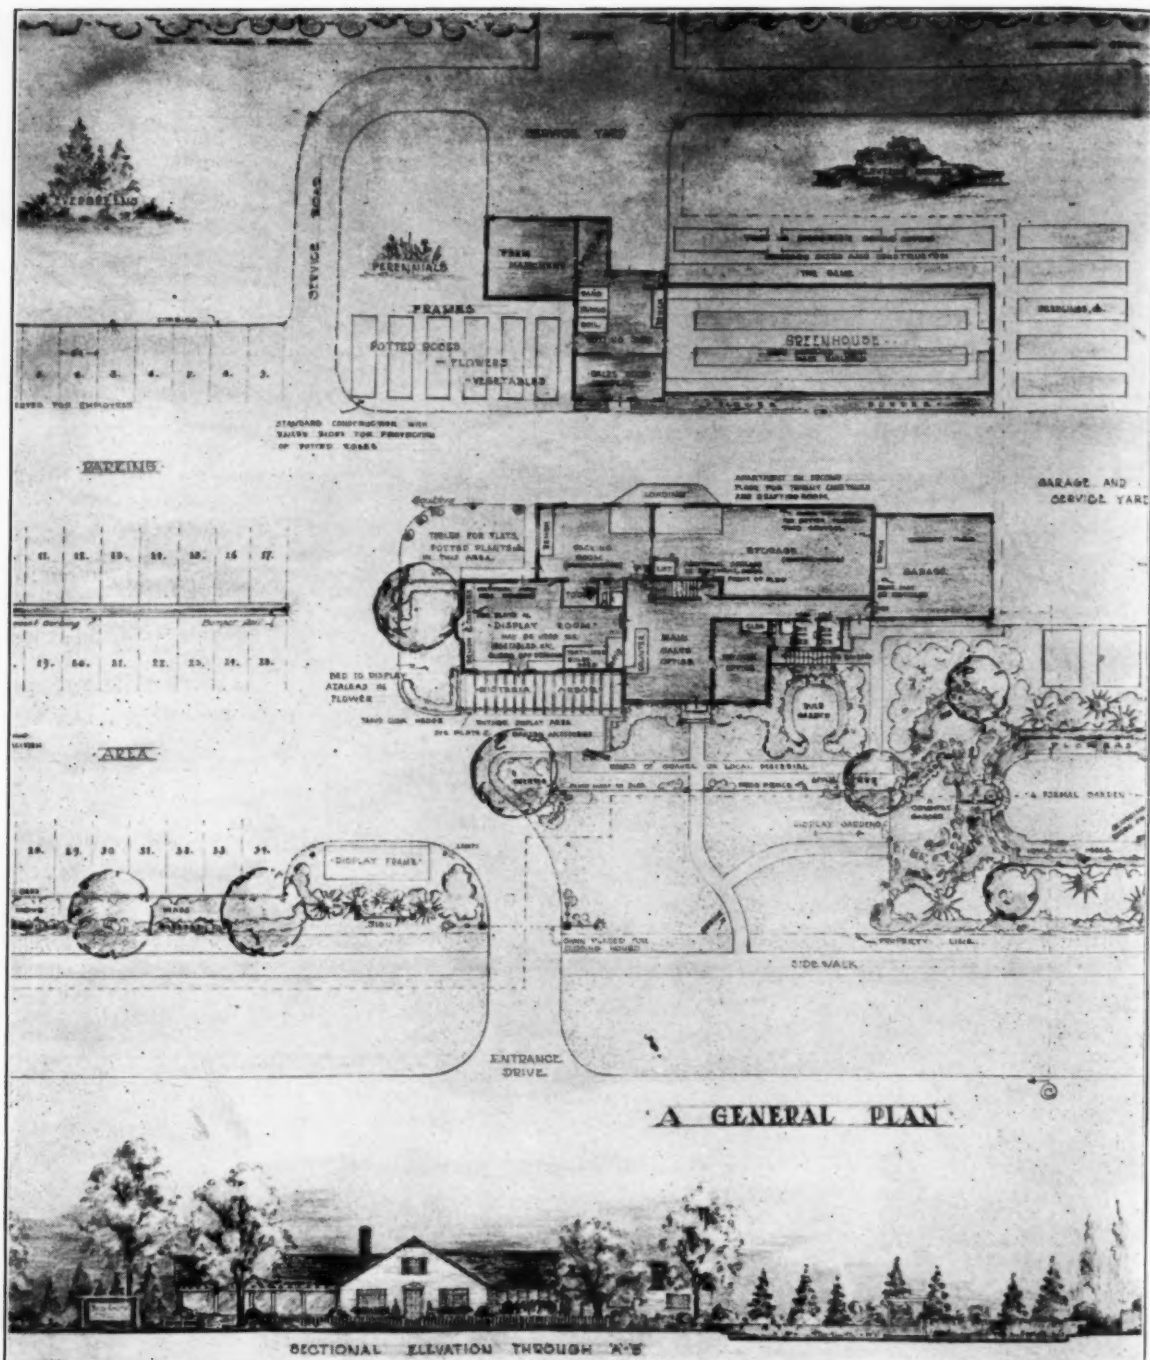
The informal country style was used for the buildings on the plan of Julian E. Schmitz, Watertown, Conn. This won him an honorable mention.
